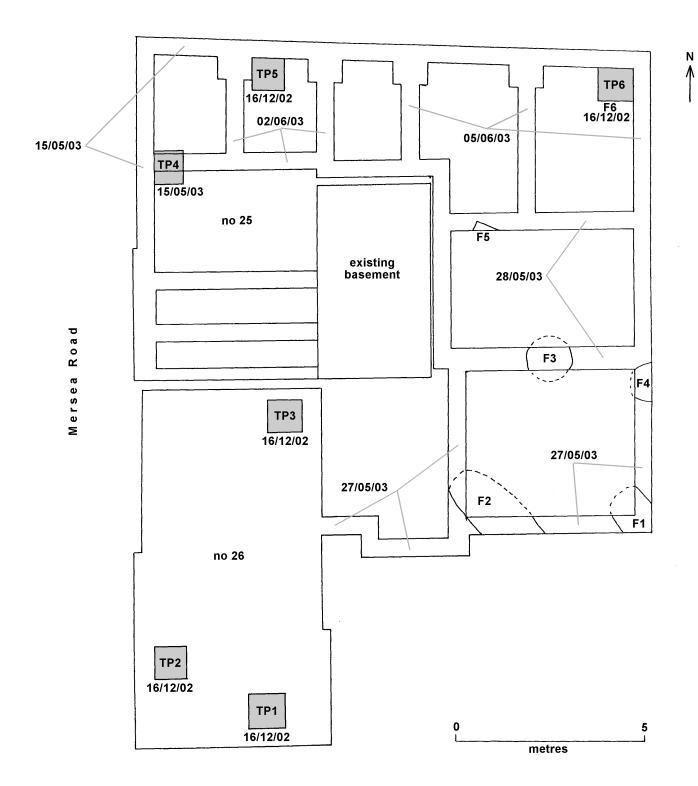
New foundation trenches: plan, showing the areas monitored and the dates on which the monitoring took place - scale 1:100.
